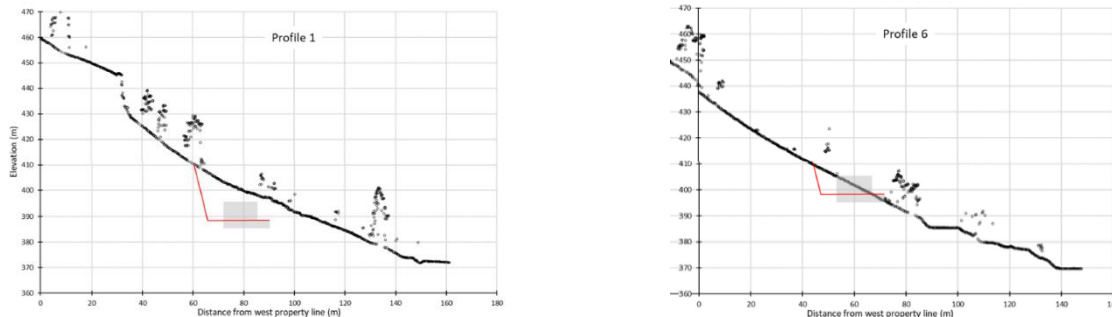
Potential Rear Yard Cuts – Soil Nail Retaining Wall from 12 to 20 m
